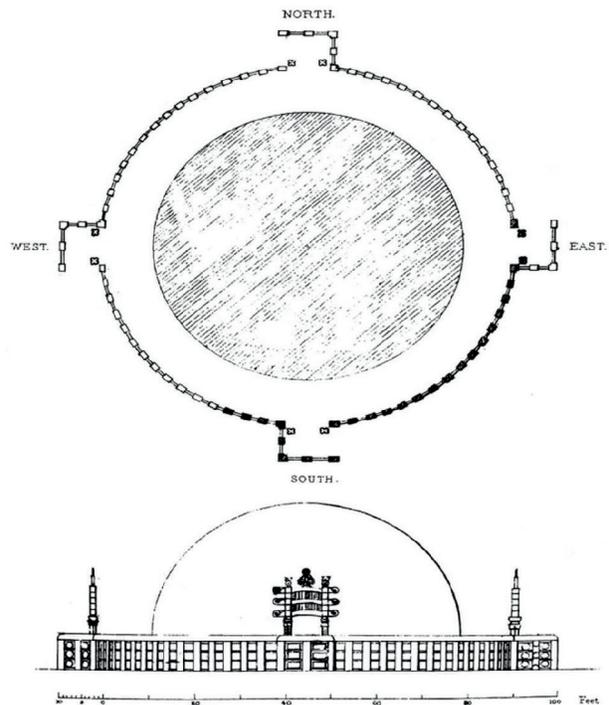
Plan and elevation of the original stupa (Courtesy: Cunningham 1879: Plate III)
